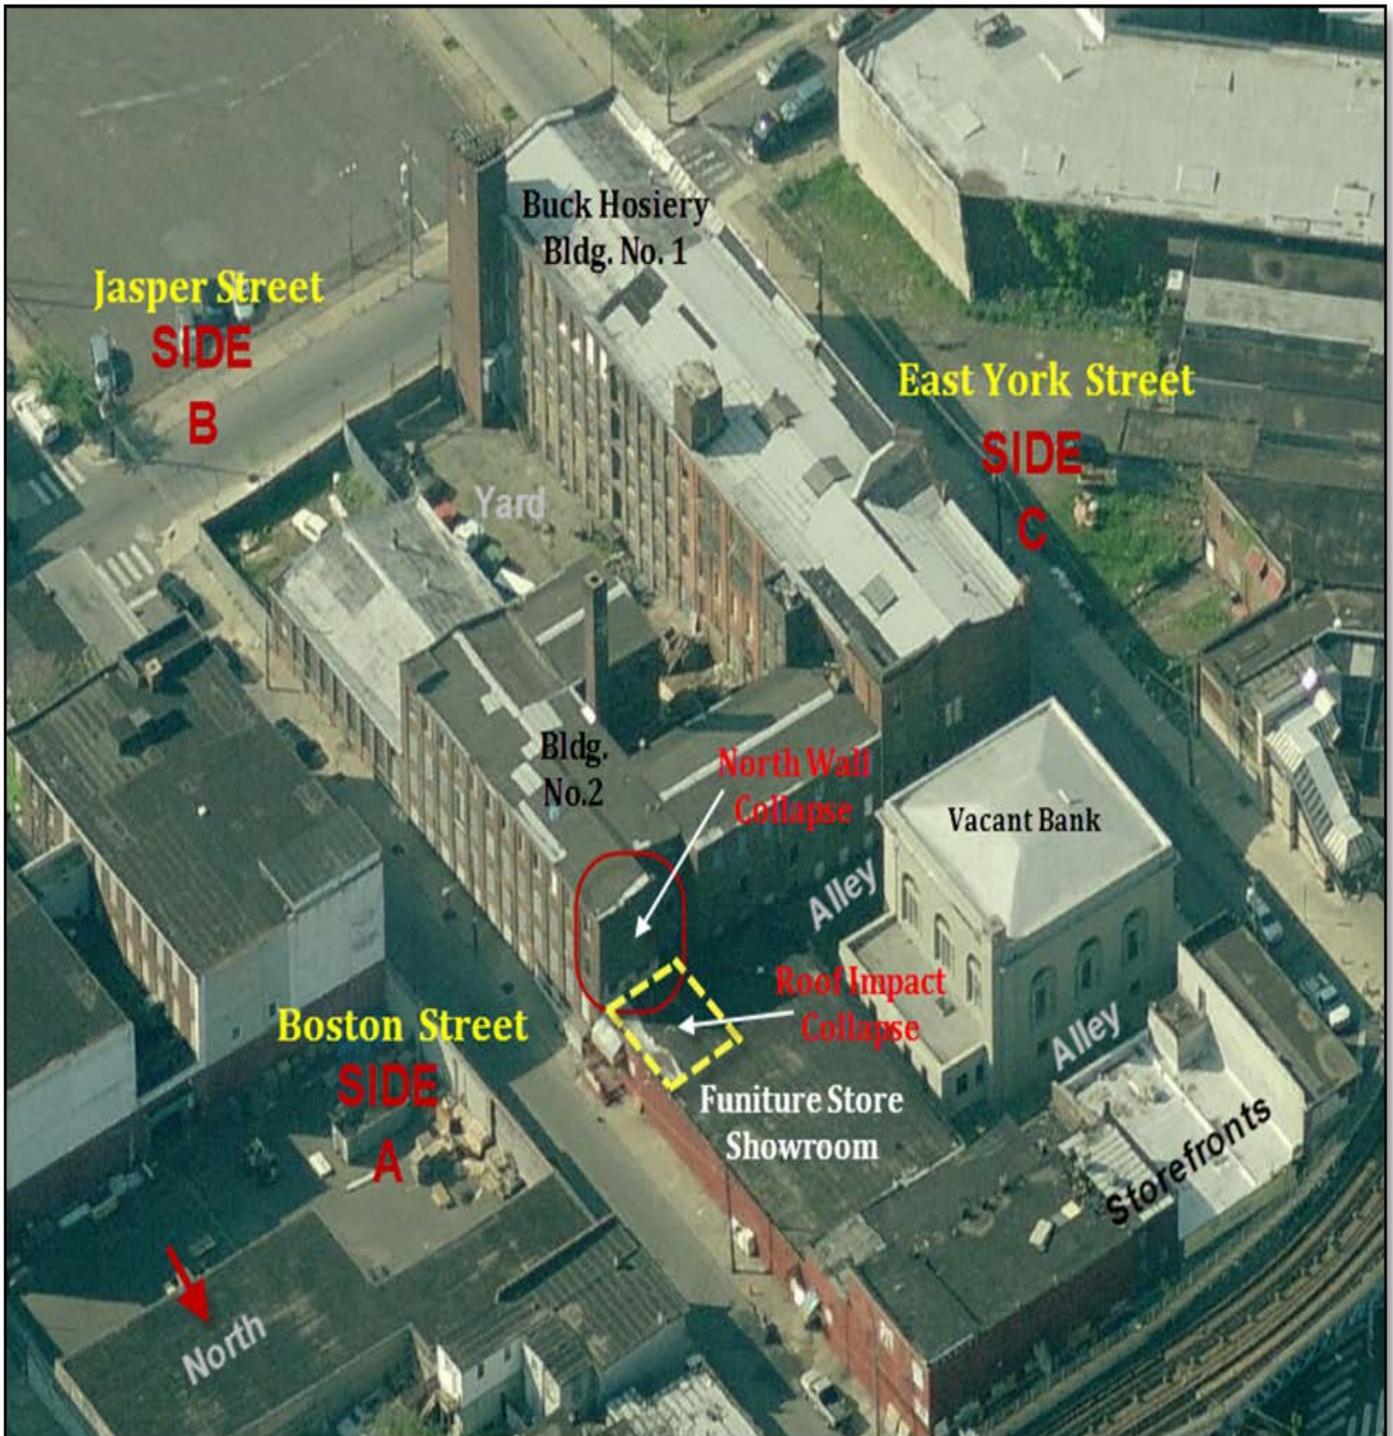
Aerial View of building complex, exposure and north wall collapse.
